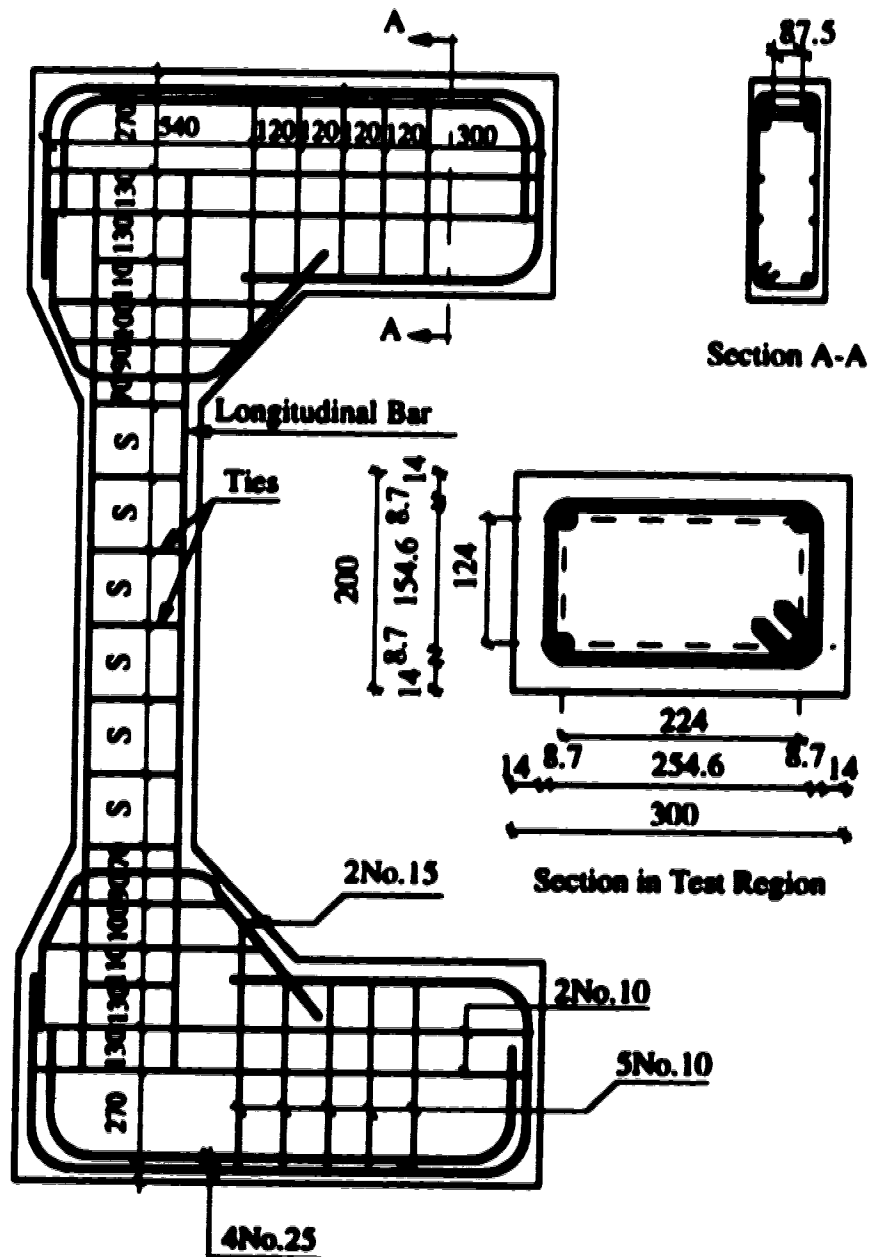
Details of Reinforcement for the Rectangular Specimens
